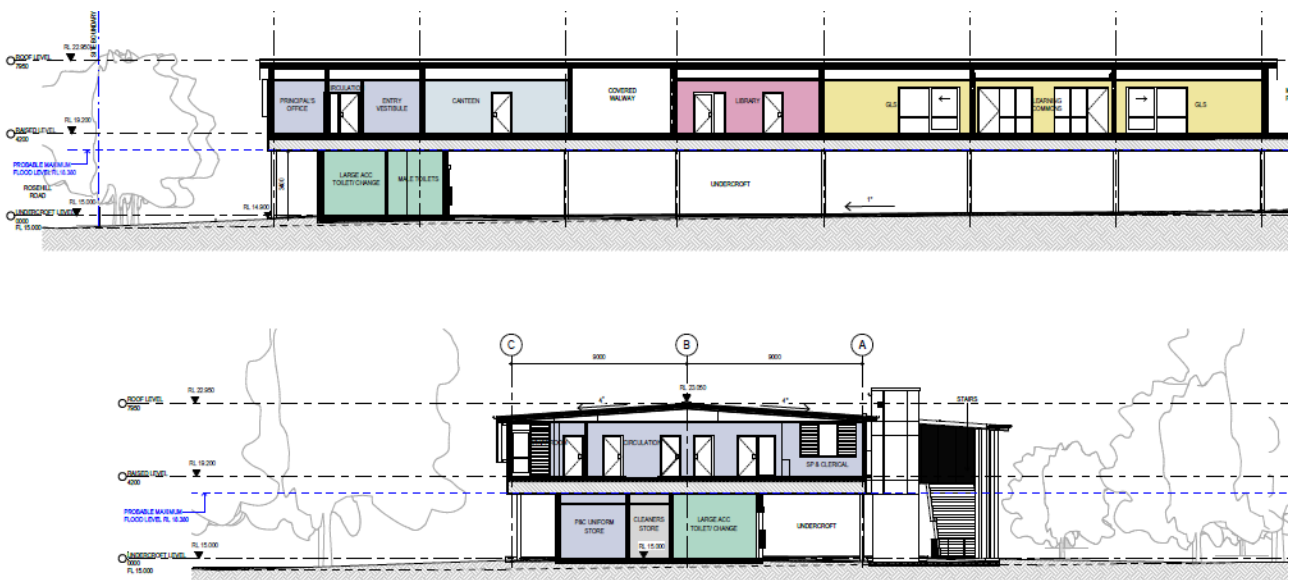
Section through new building with PMF level in blue and proposed MHFL above it. (Source: Pedavoli Architects)
